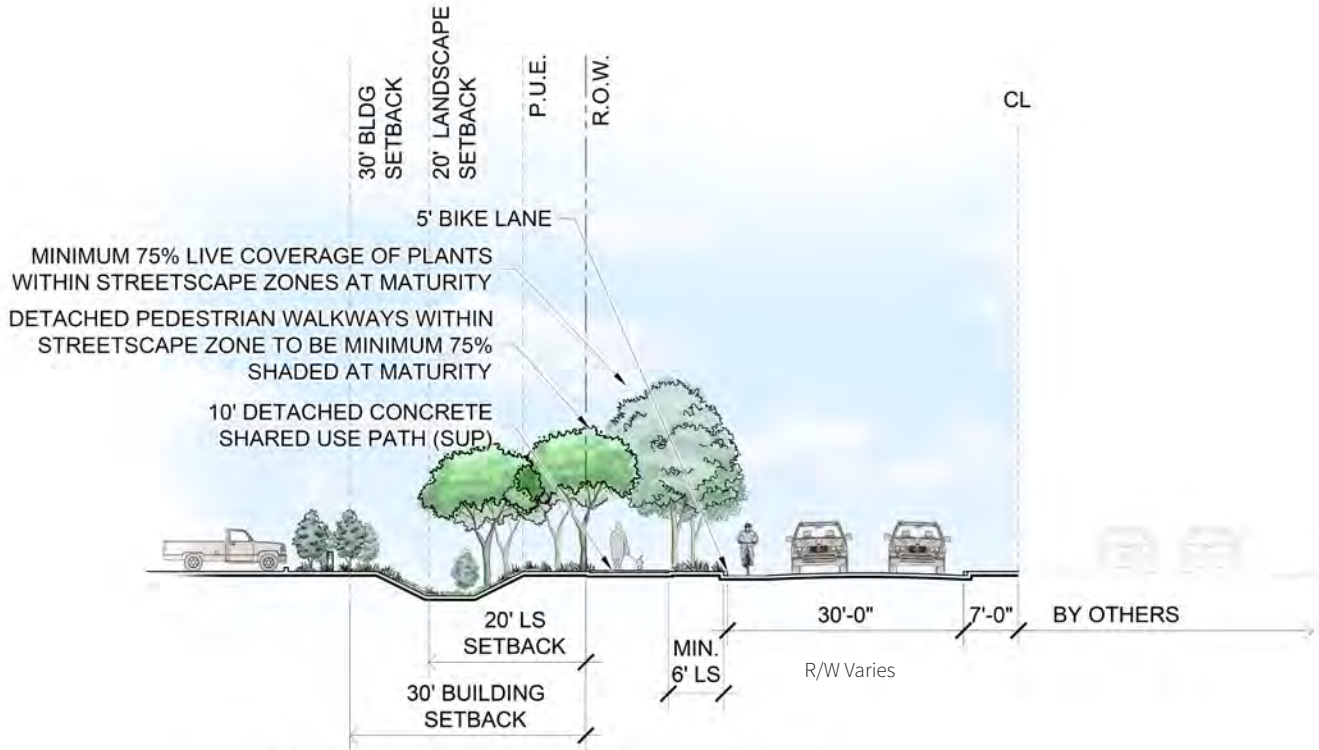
Conceptual Streetscape Exhibit - 59th Avenue, Section View
